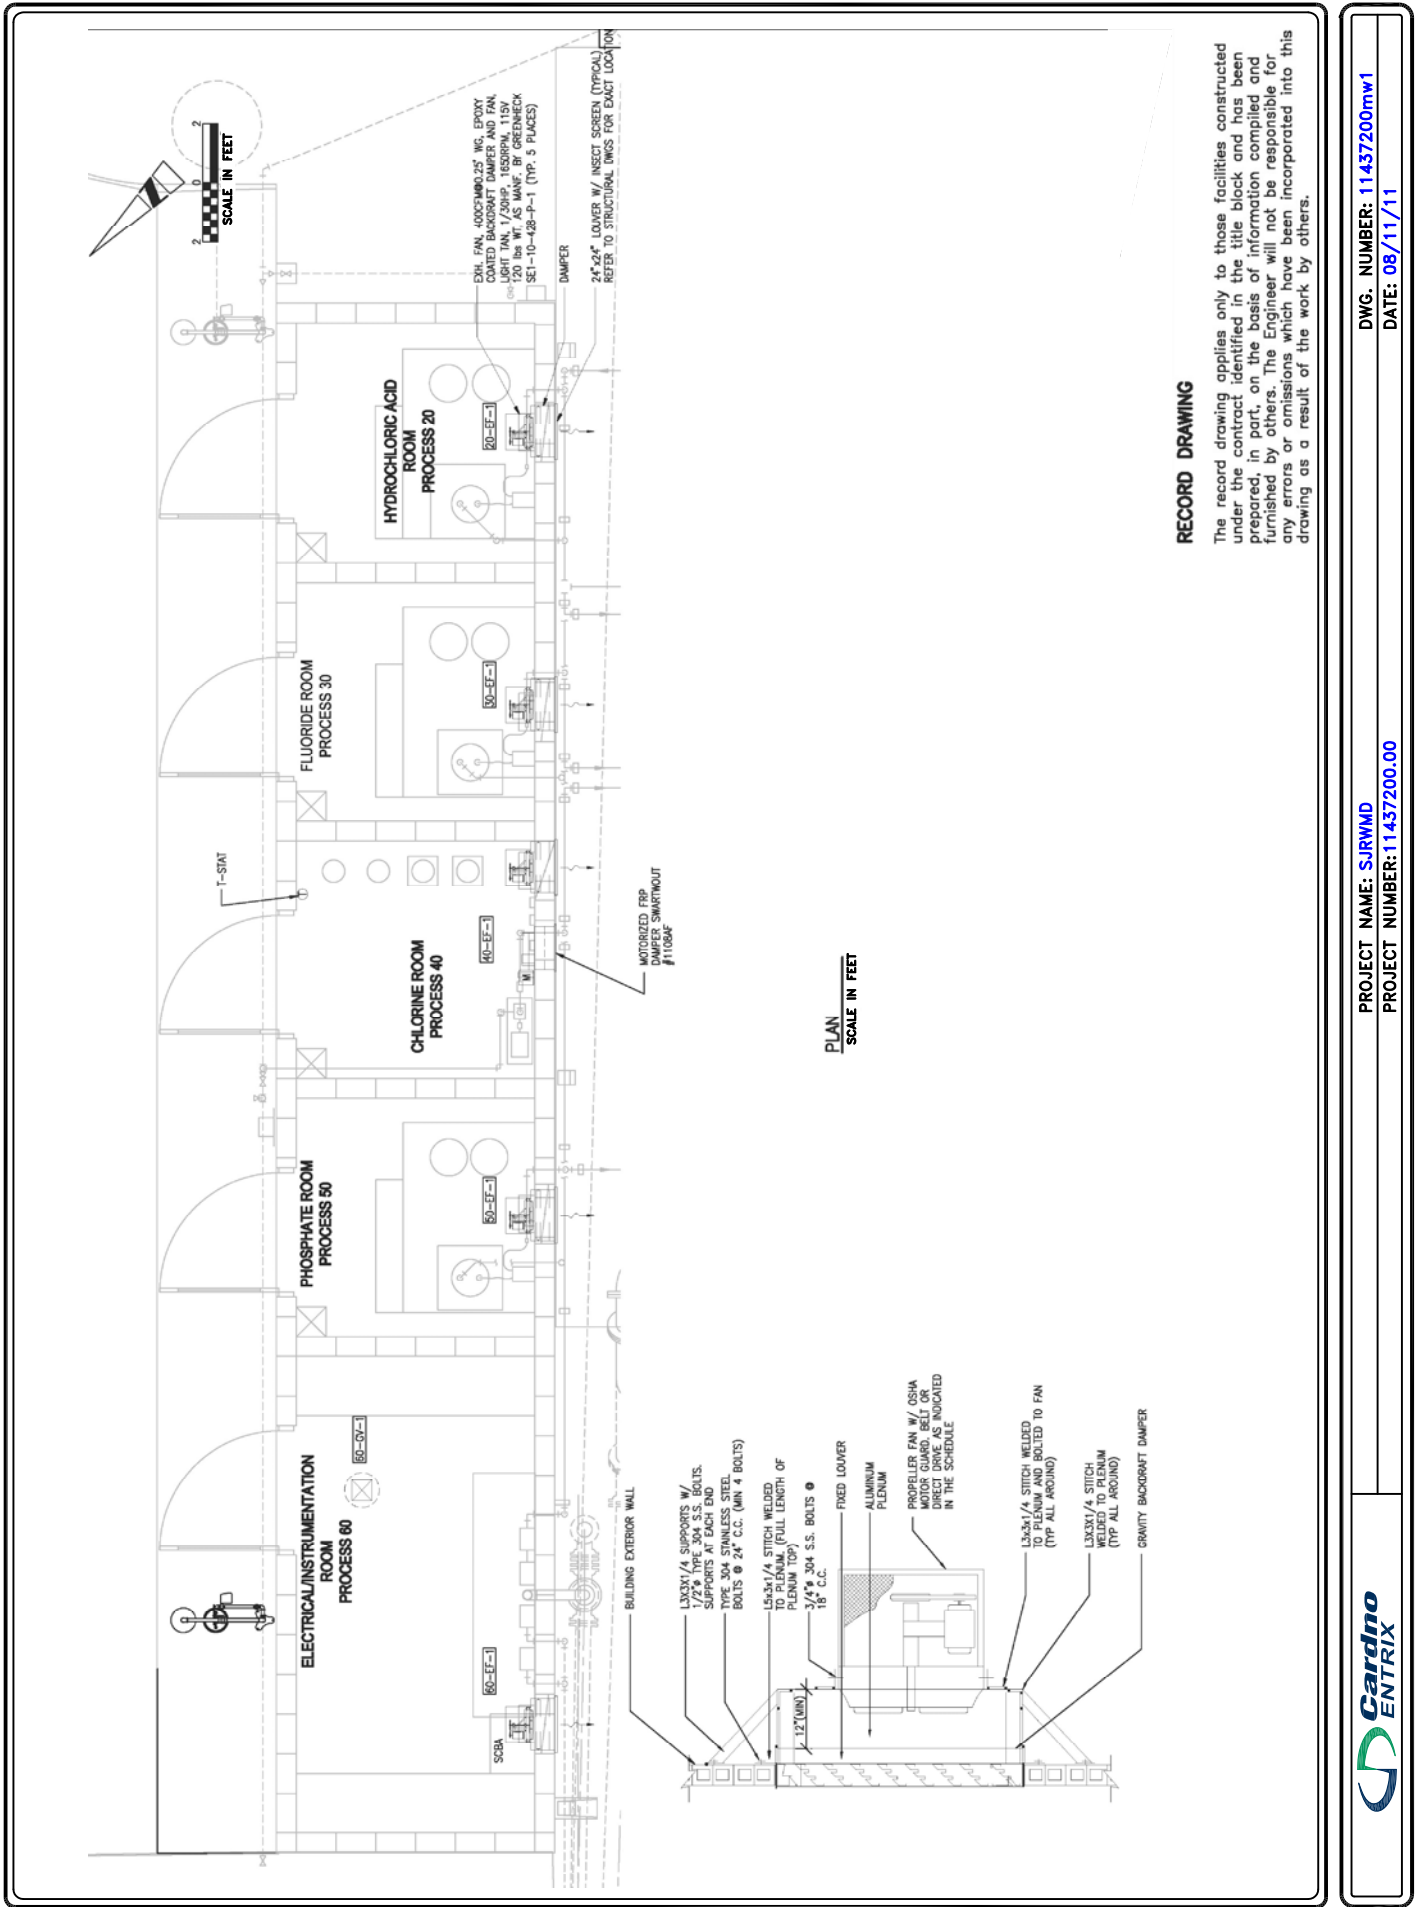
PROPOSED DESIGN PLAN OF BUILDING AND PIPING.
